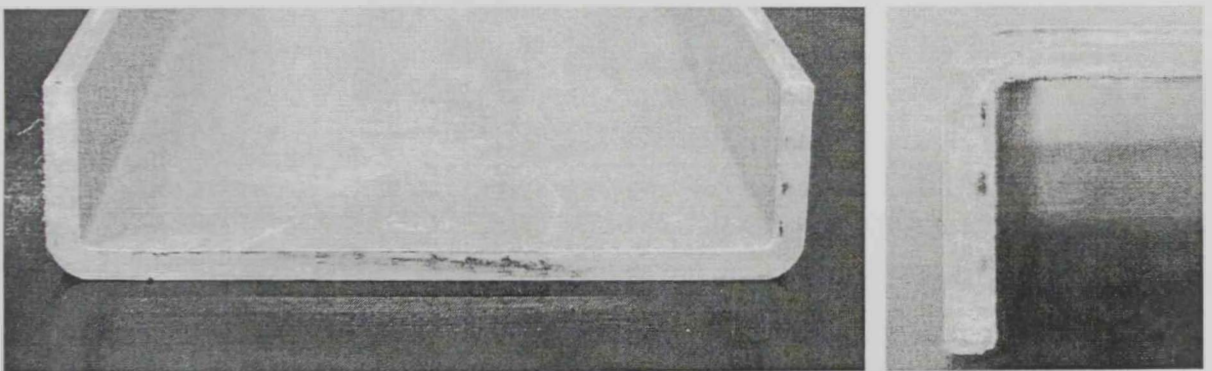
Image of single pultruded Extren GFRP channel showing cross section and corner detail
